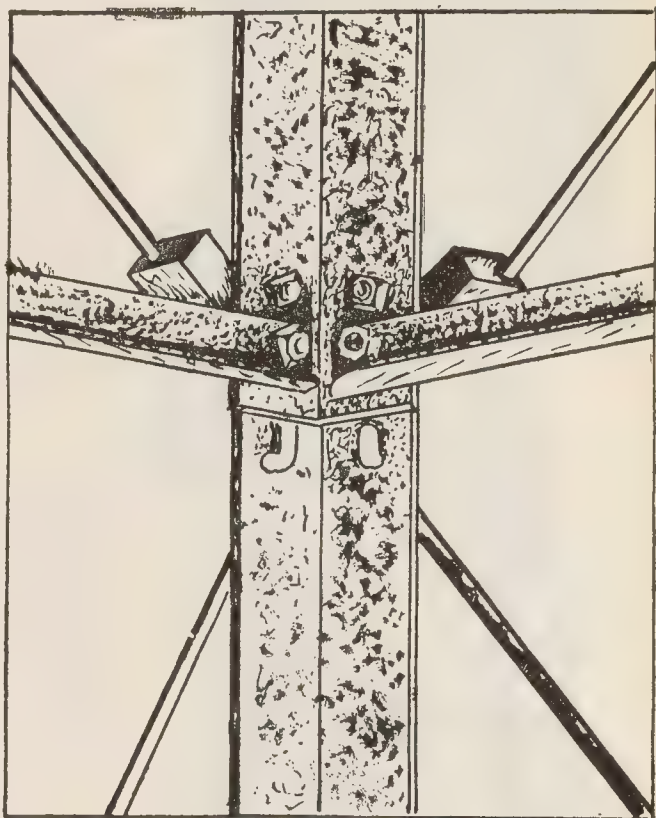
,822.—Butler steel tower construction 1. Brace rod.
